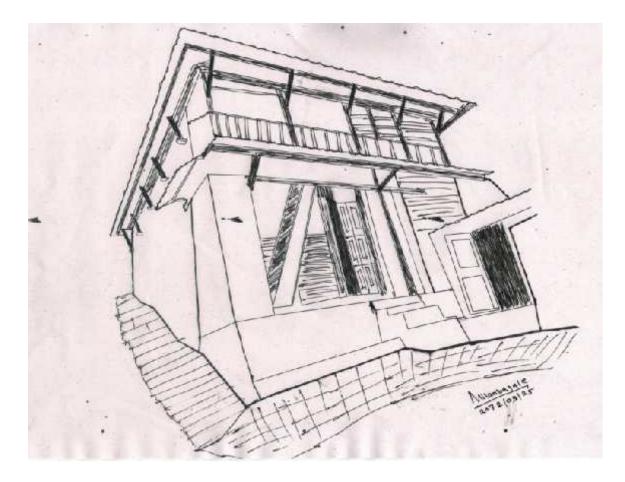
South-West view of building (Quick Sketch drawn on site, 2015)
